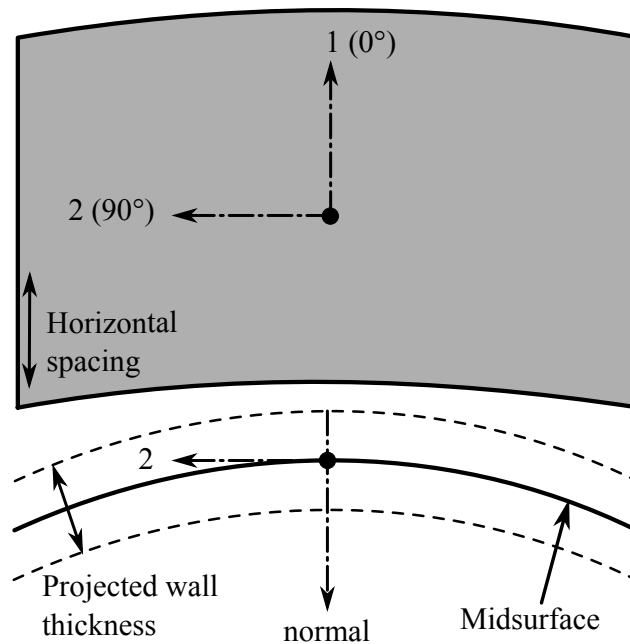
Material orientation of tower shell sections and reinforcement layers.
